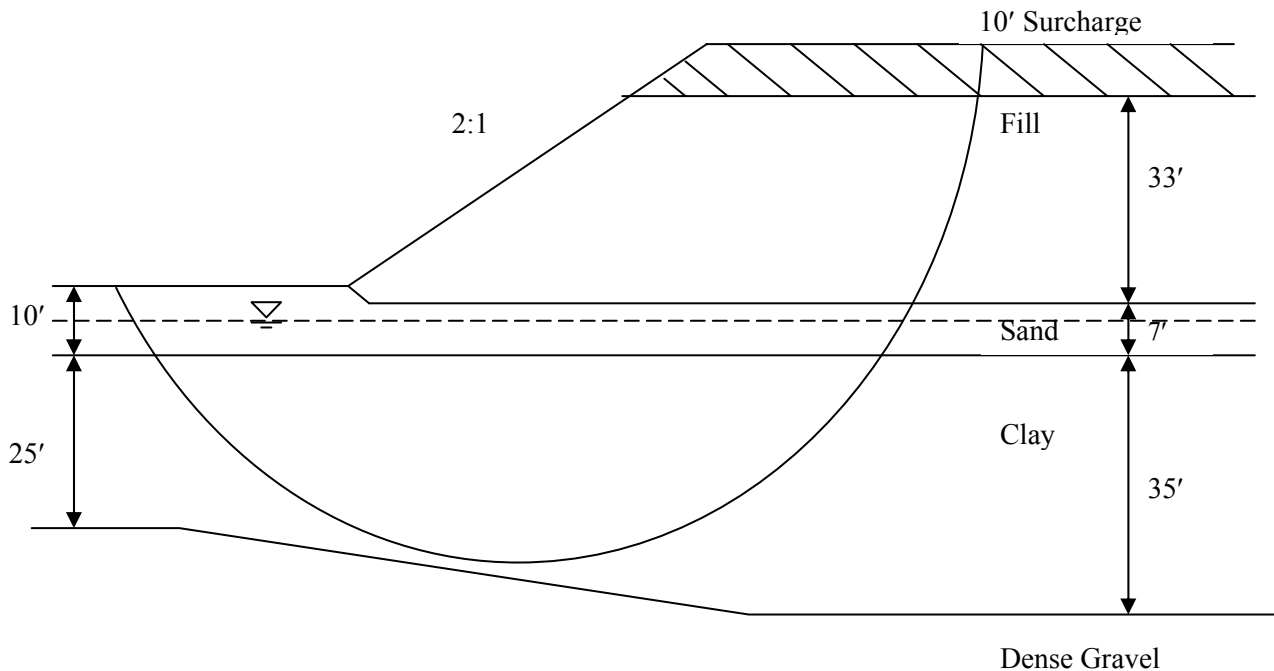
Trial failure circle – embankment fill + surcharge - East Abutment.
